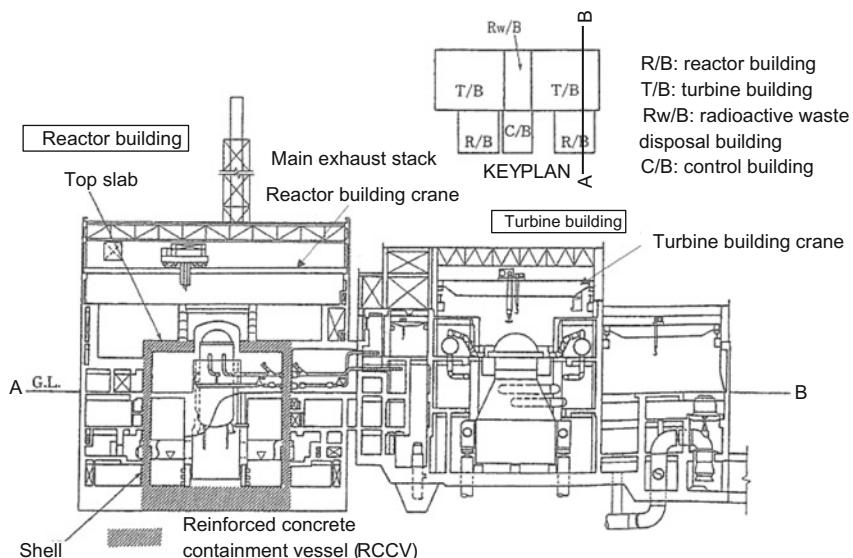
Buildings of an ABWR plant of 1.35 million kWe class (single-box type) [1]
